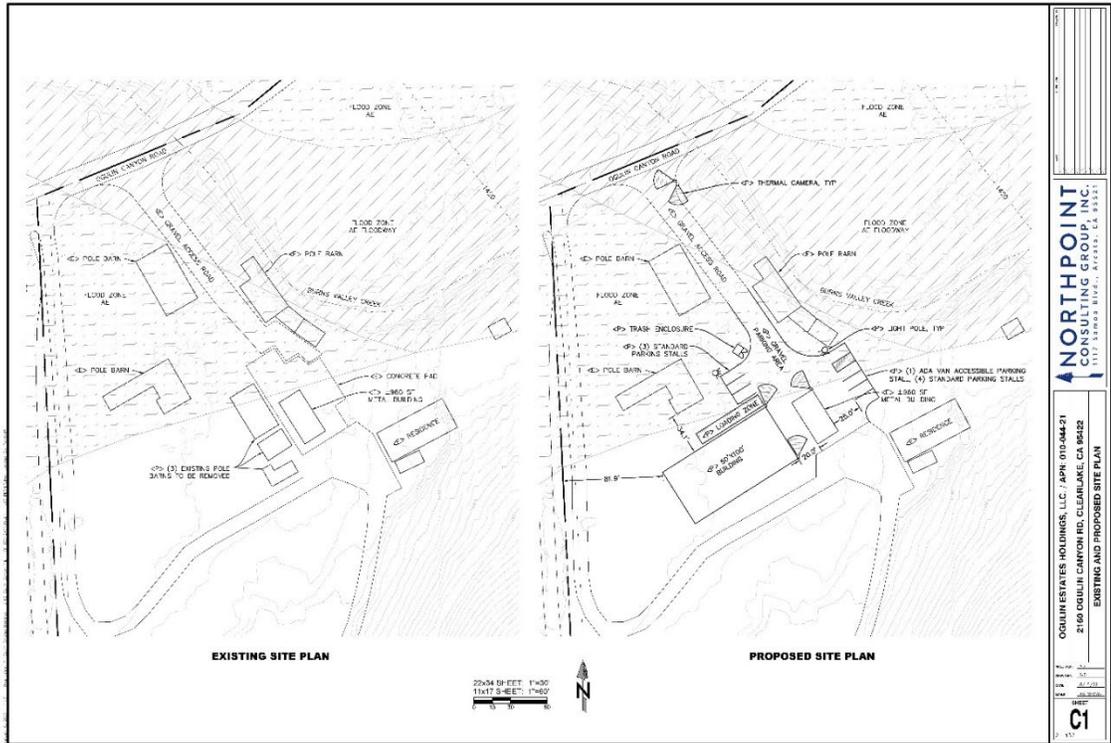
Project Site Plan (Refer to Attachment B for full plans)
